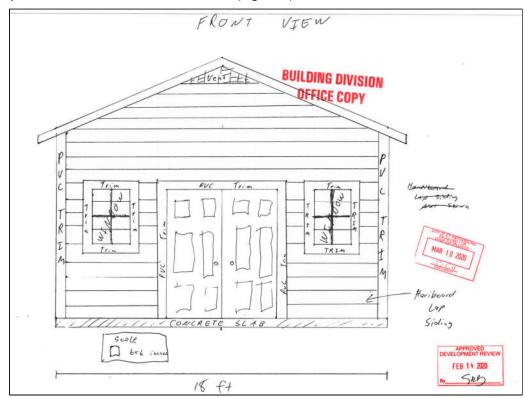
Proposed south elevation (to face rear elevation of primary residence on property), from application
